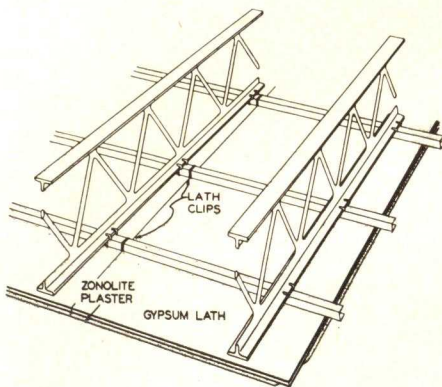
Furred ceiling Zonolite Plaster on Gypsum Lath.
